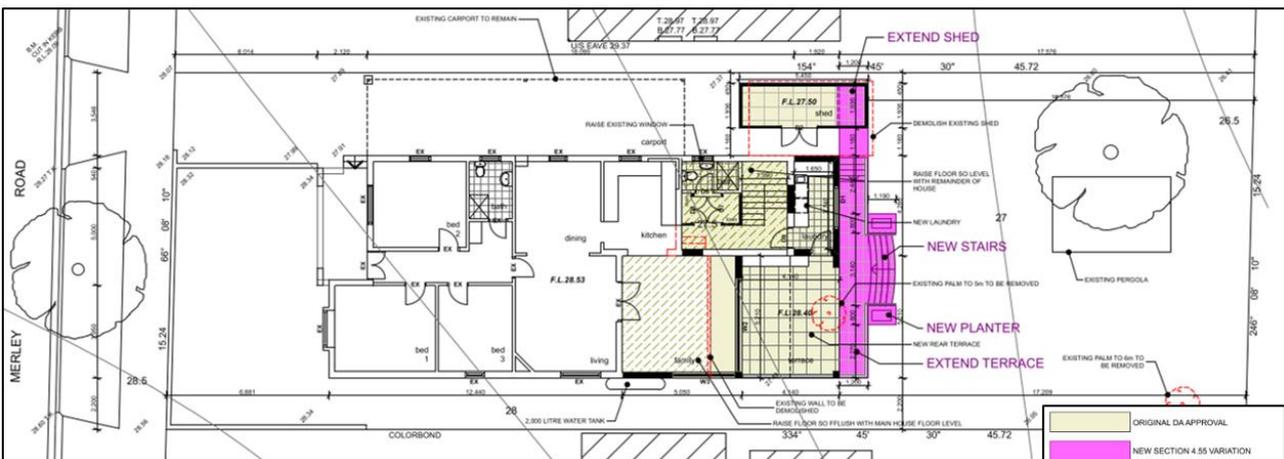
Ground floor plan illustrating the original approved development (yellow) and proposed amendments (fuchsia).
